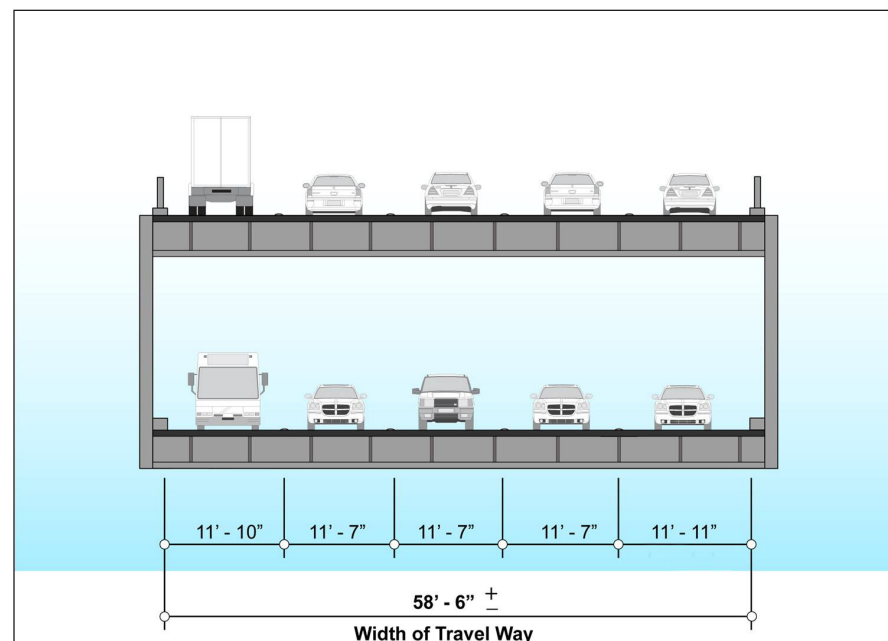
Bay Bridge Suspension Span Roadway Cross-Section
